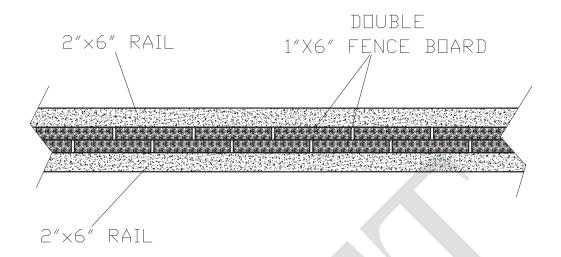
Minimum Recommended Wooden Fence Construction Sectional View
